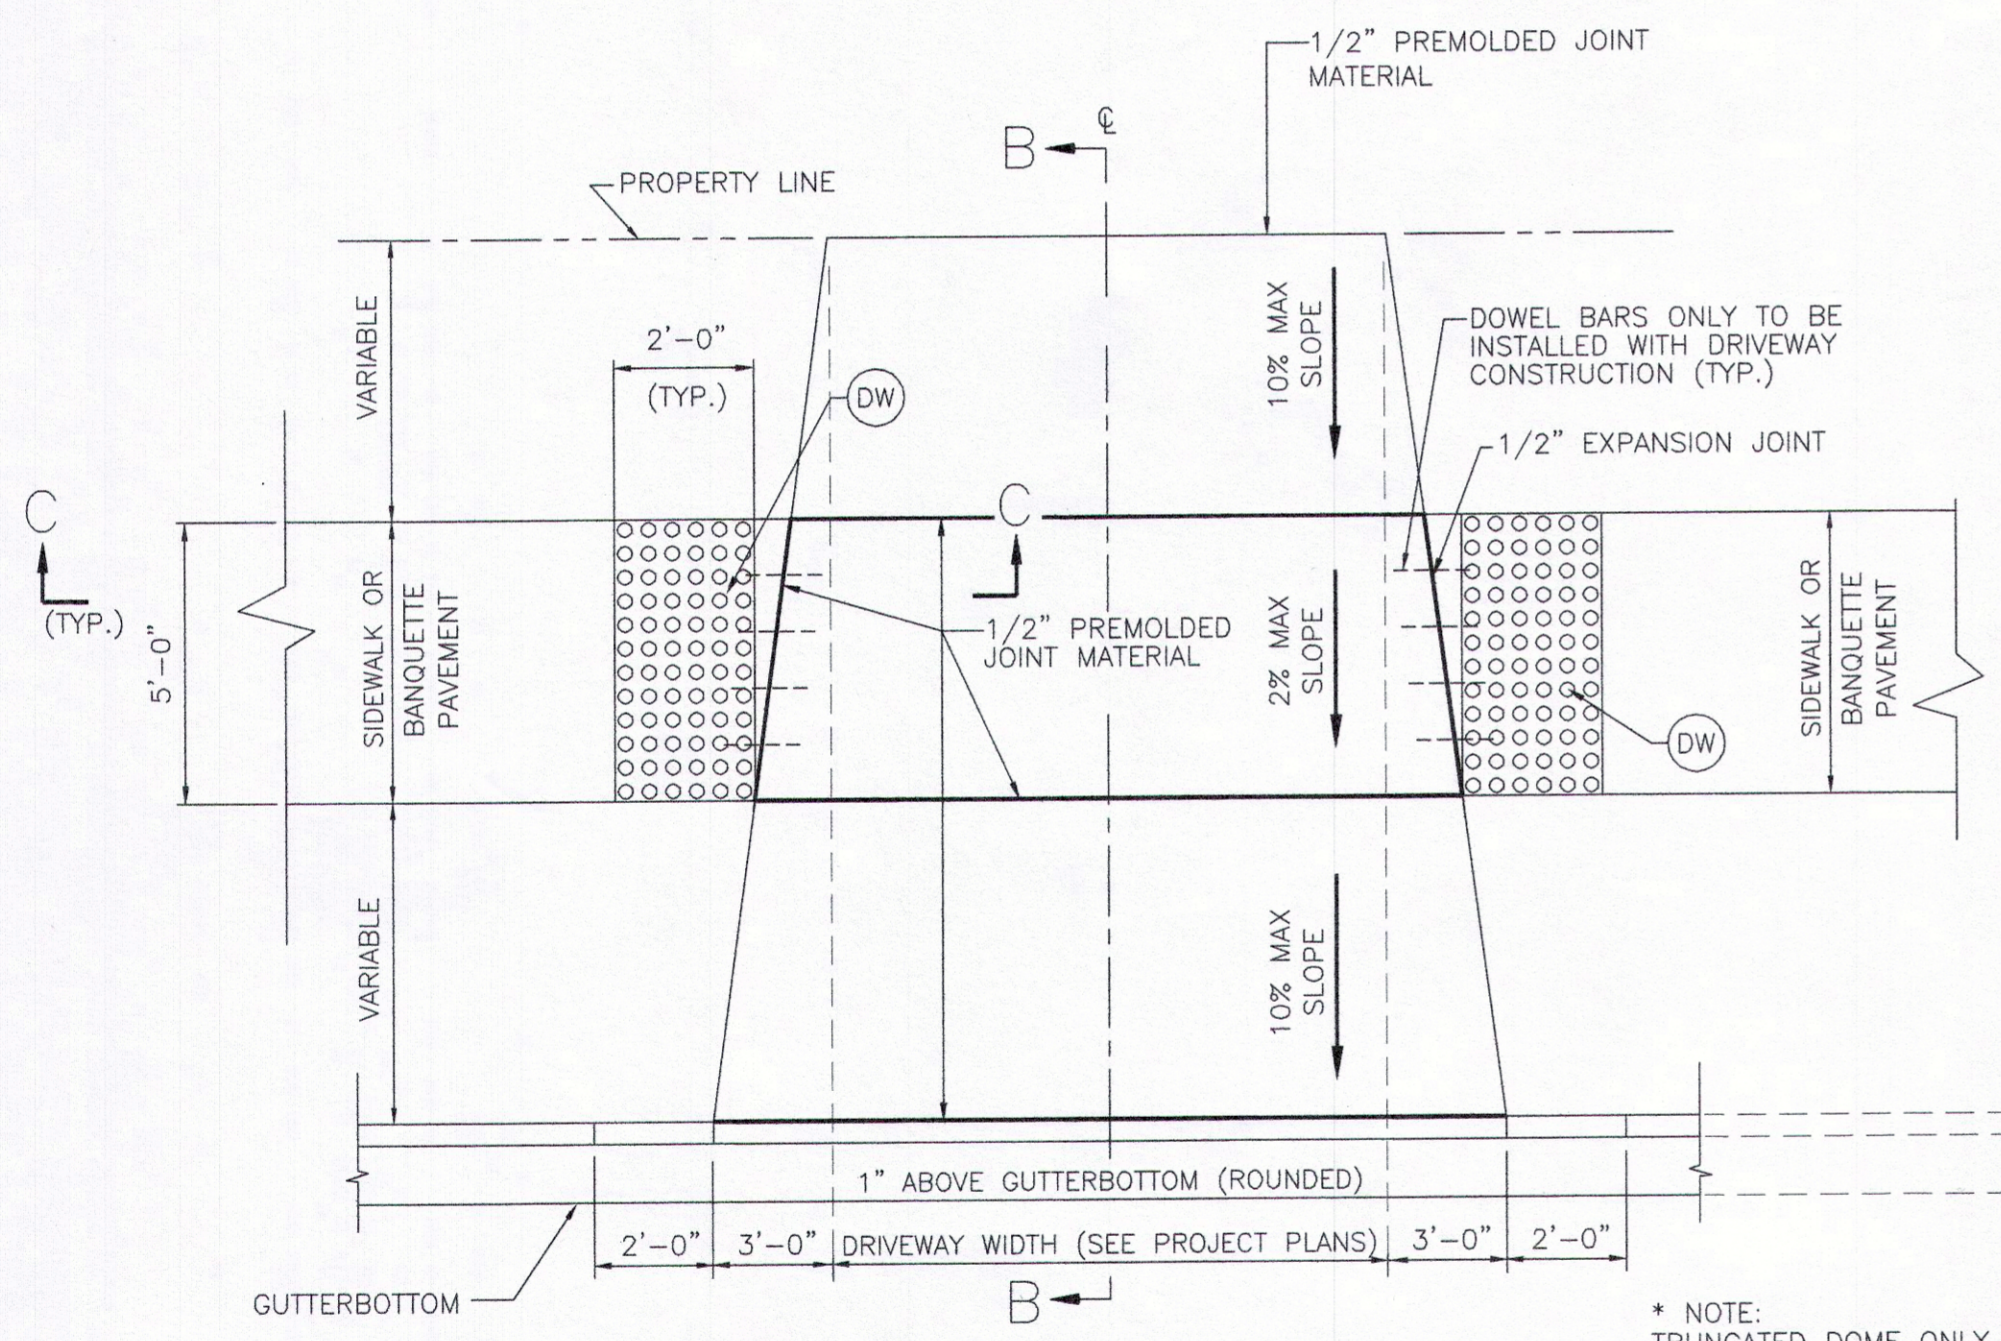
DETAIL OF STANDARD DRIVEWAY FOR CONCRETE VERTICAL CURB
